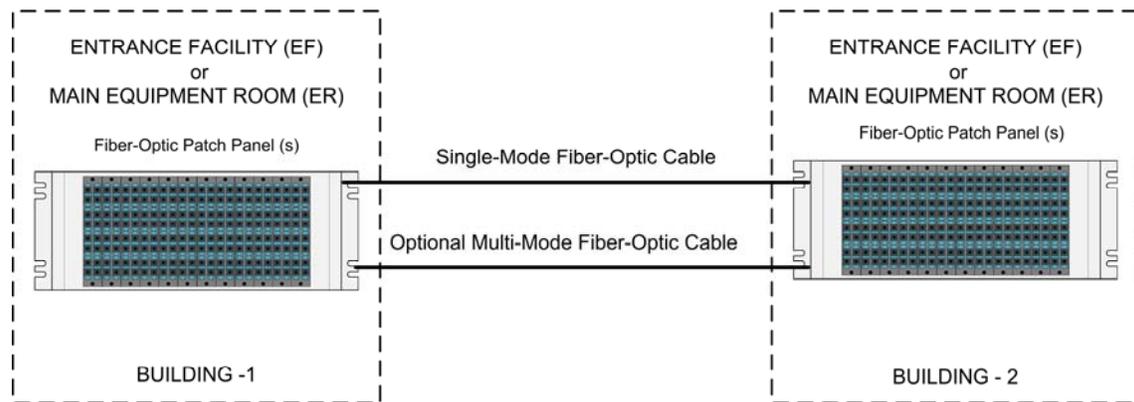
Main Equipment Room (ER) to Main Equipment Room (ER) Inter-Building Fiber-Optic Backbone Cable System
